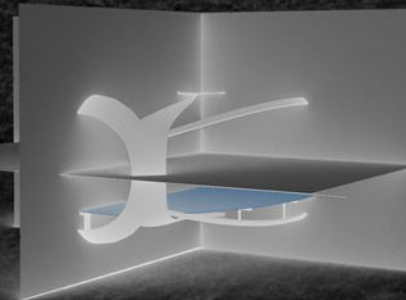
Illustration of similar sections to be manufactured and planes around which the sections are mirrored (author)
